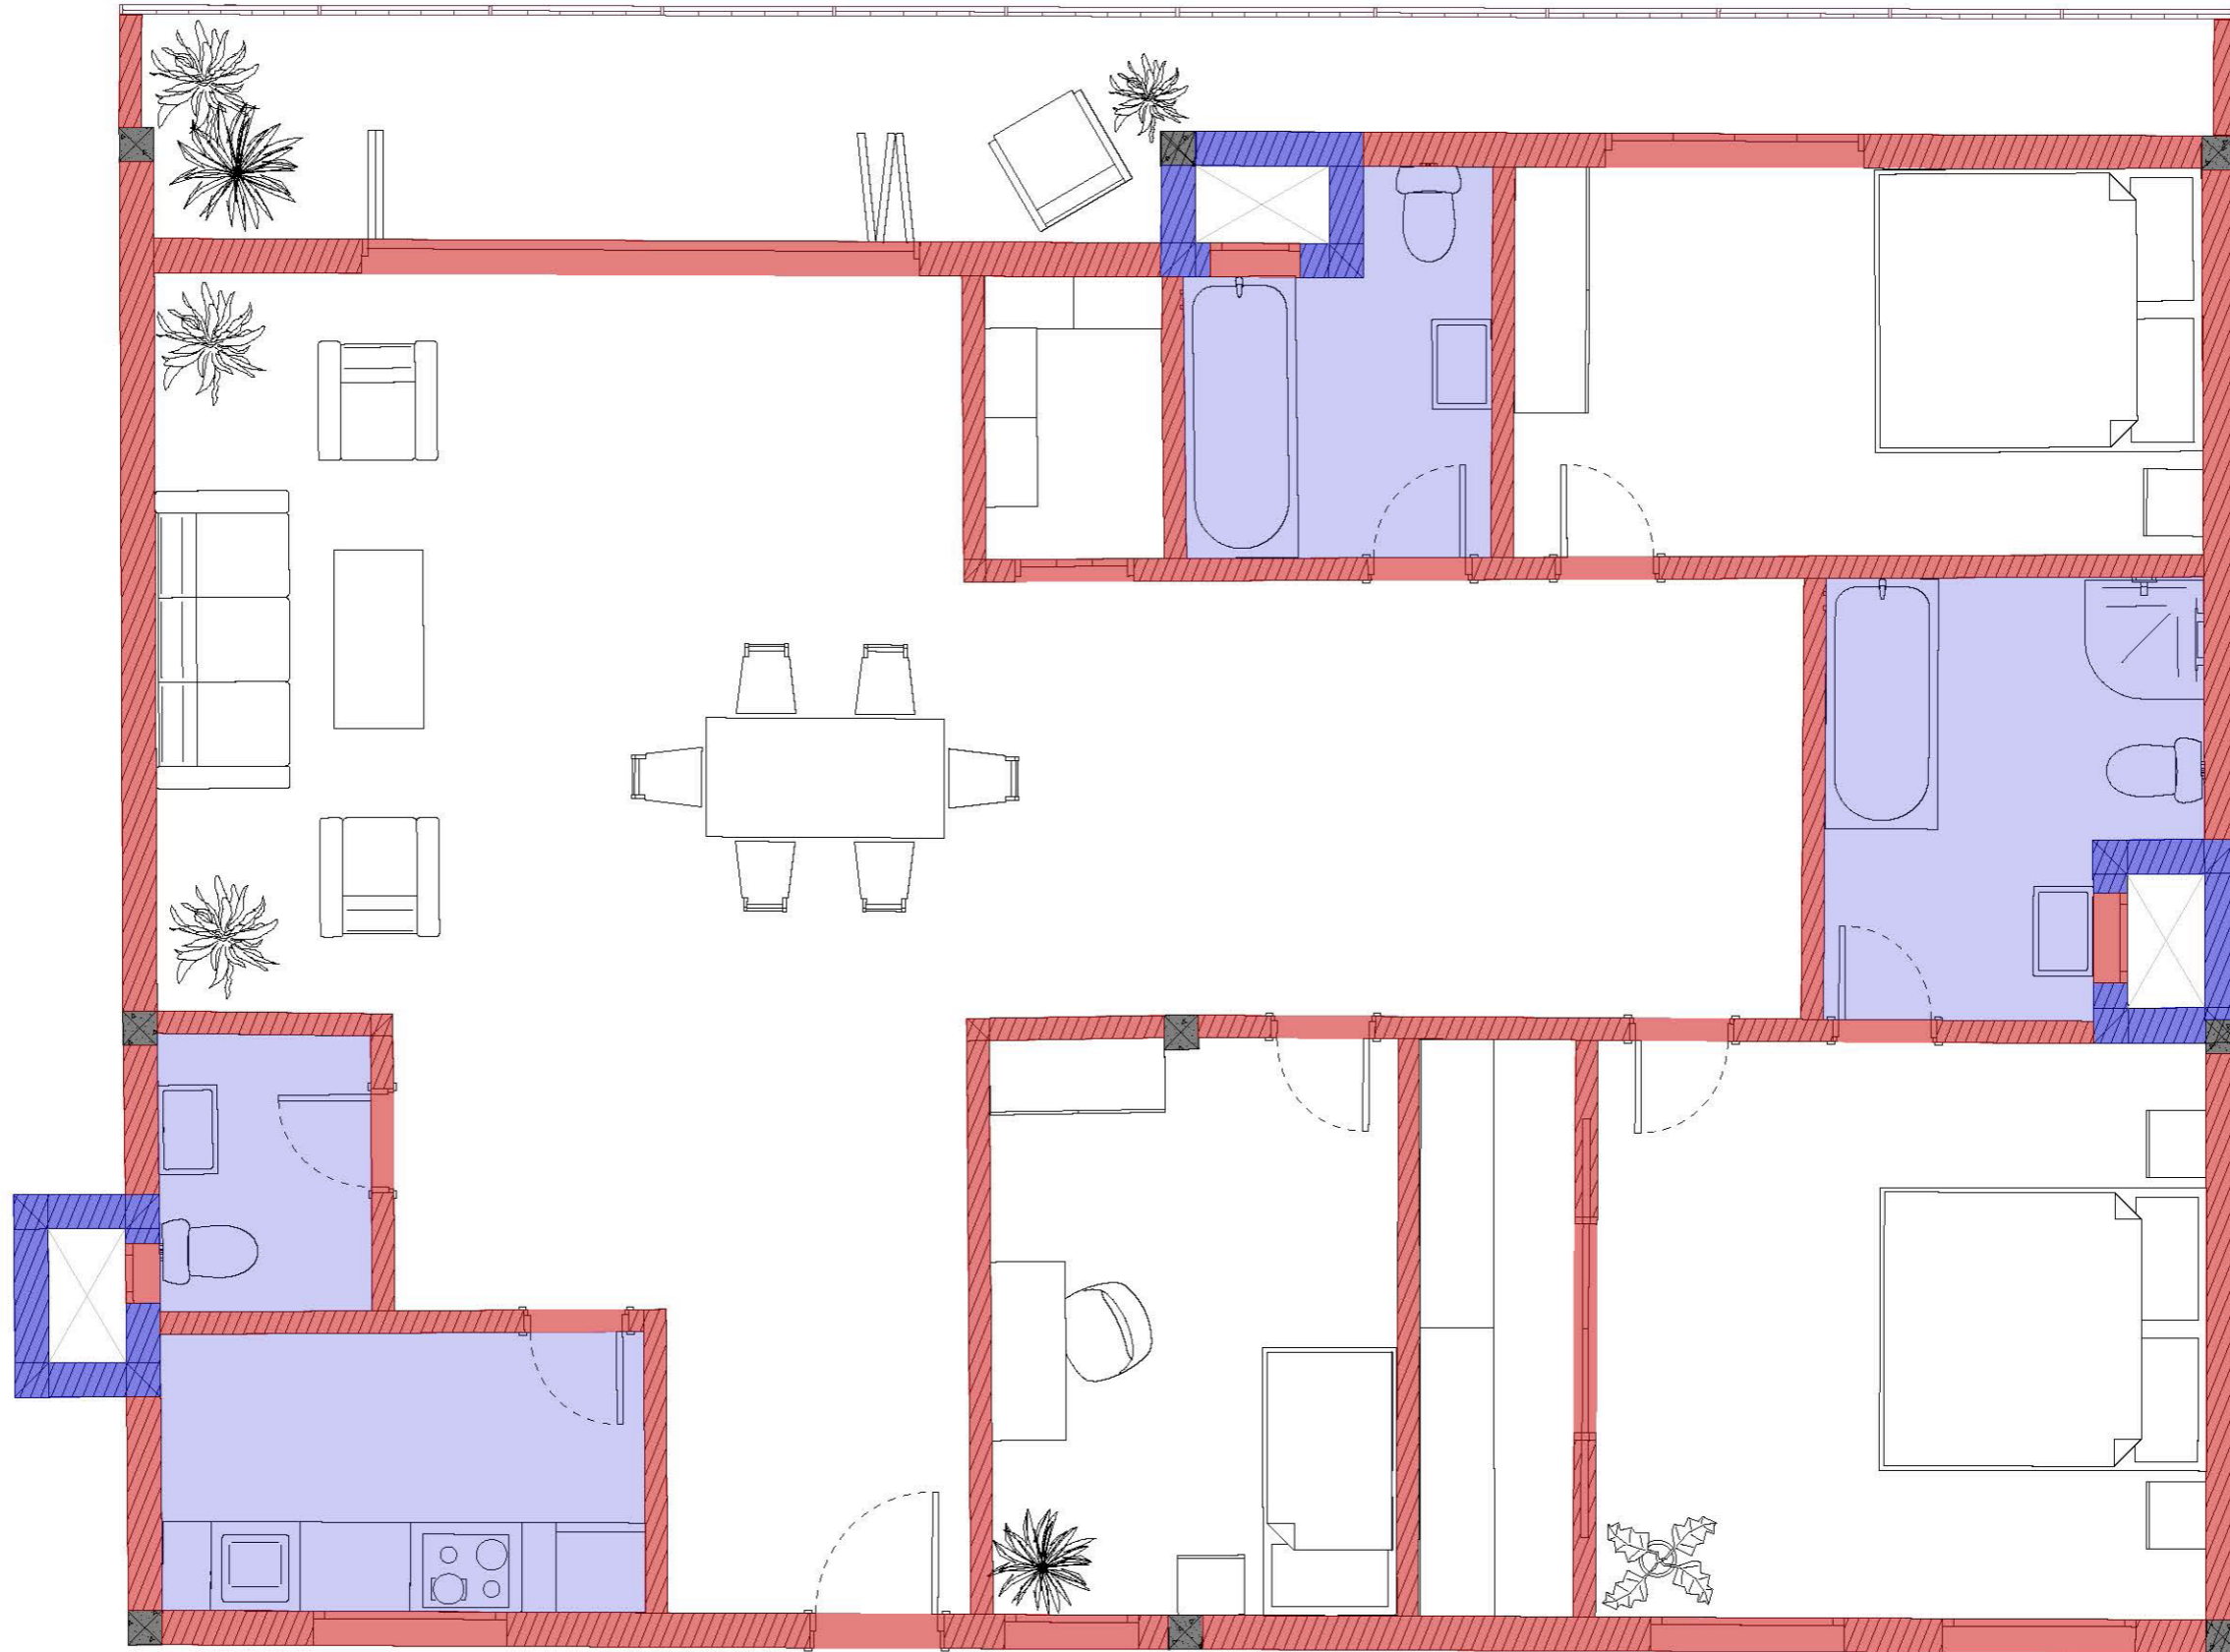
Groundfloor of a type D apartment (author's work, 2026)
